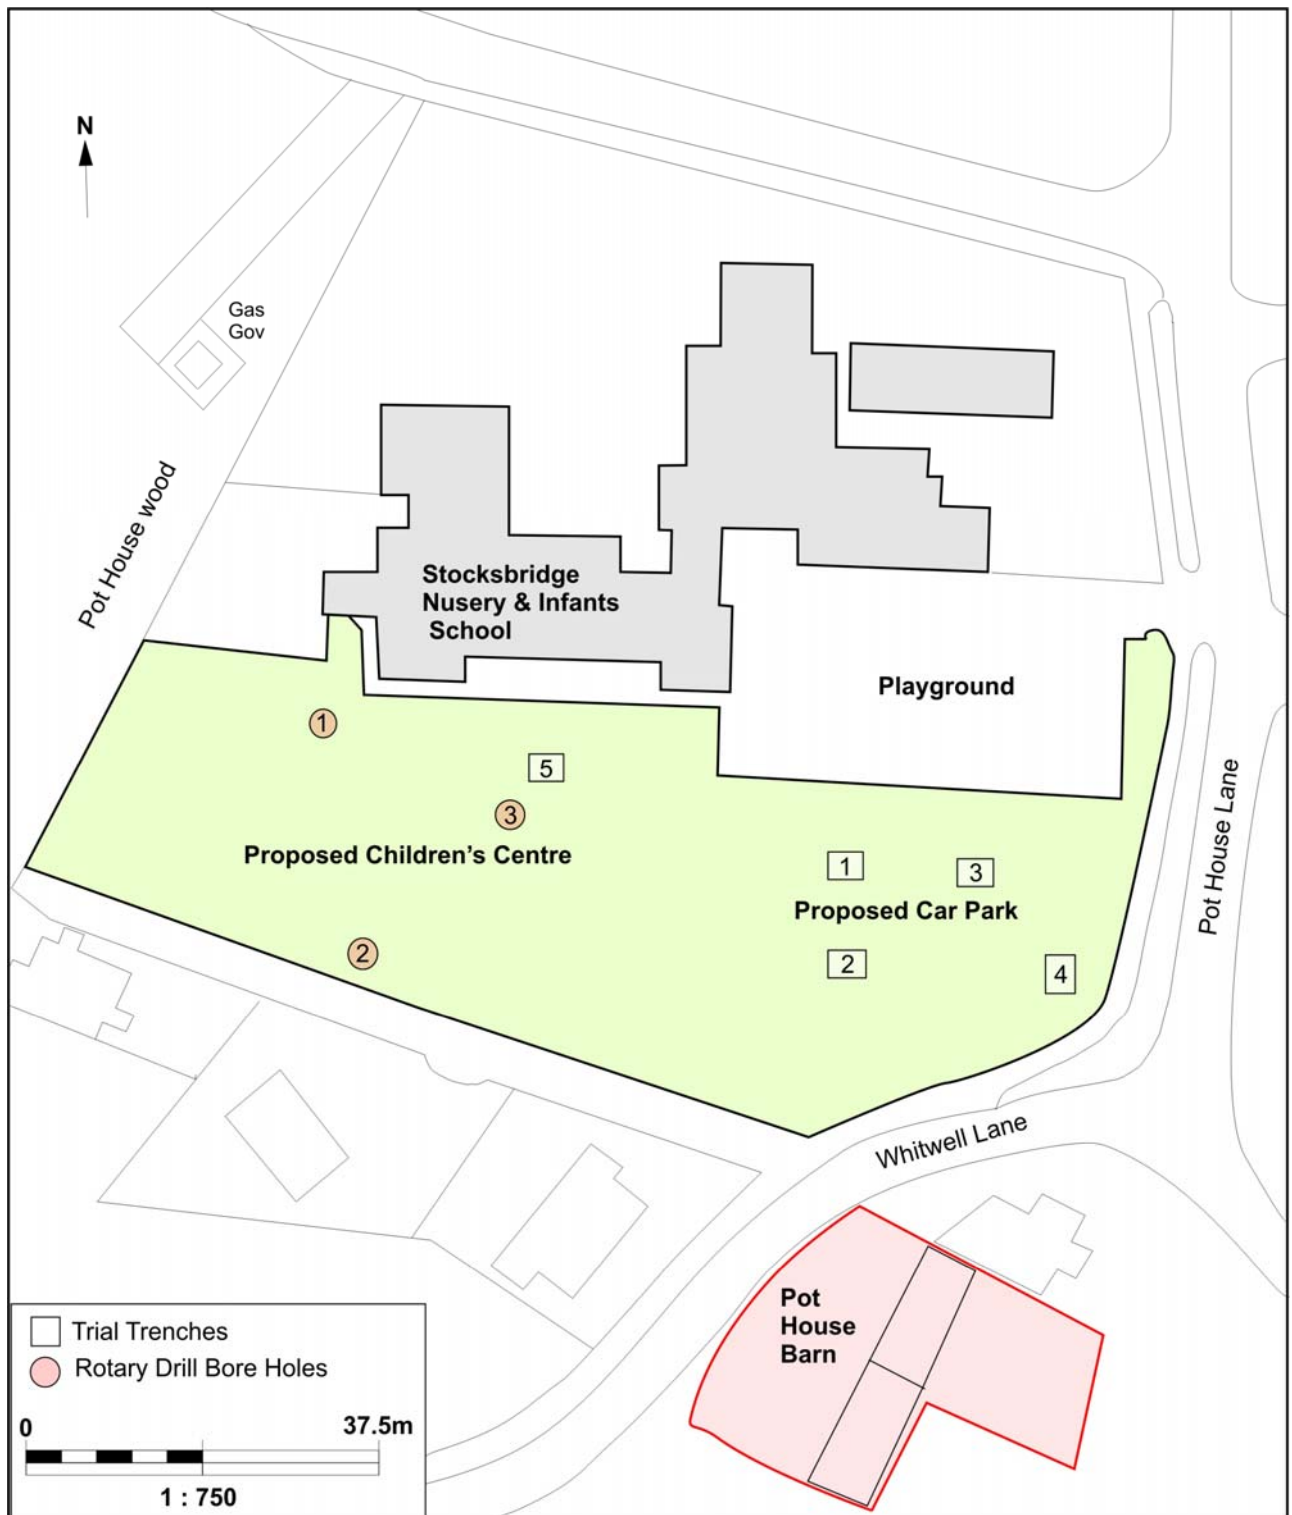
Plan of the site showing location of bore holes and trial trenches.
